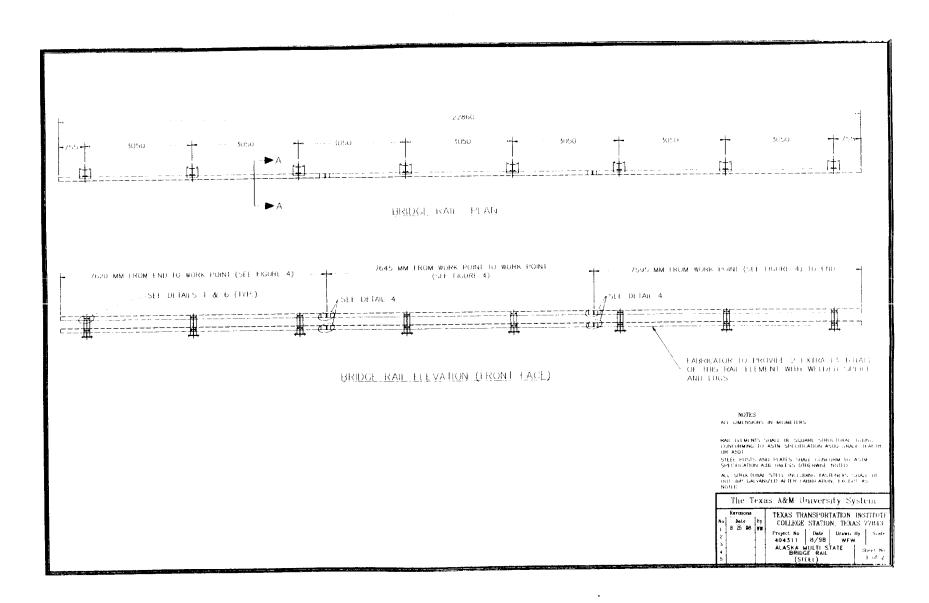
Details of the Alaska Multi-State Bridge Railing mounted on the curb (steel).
